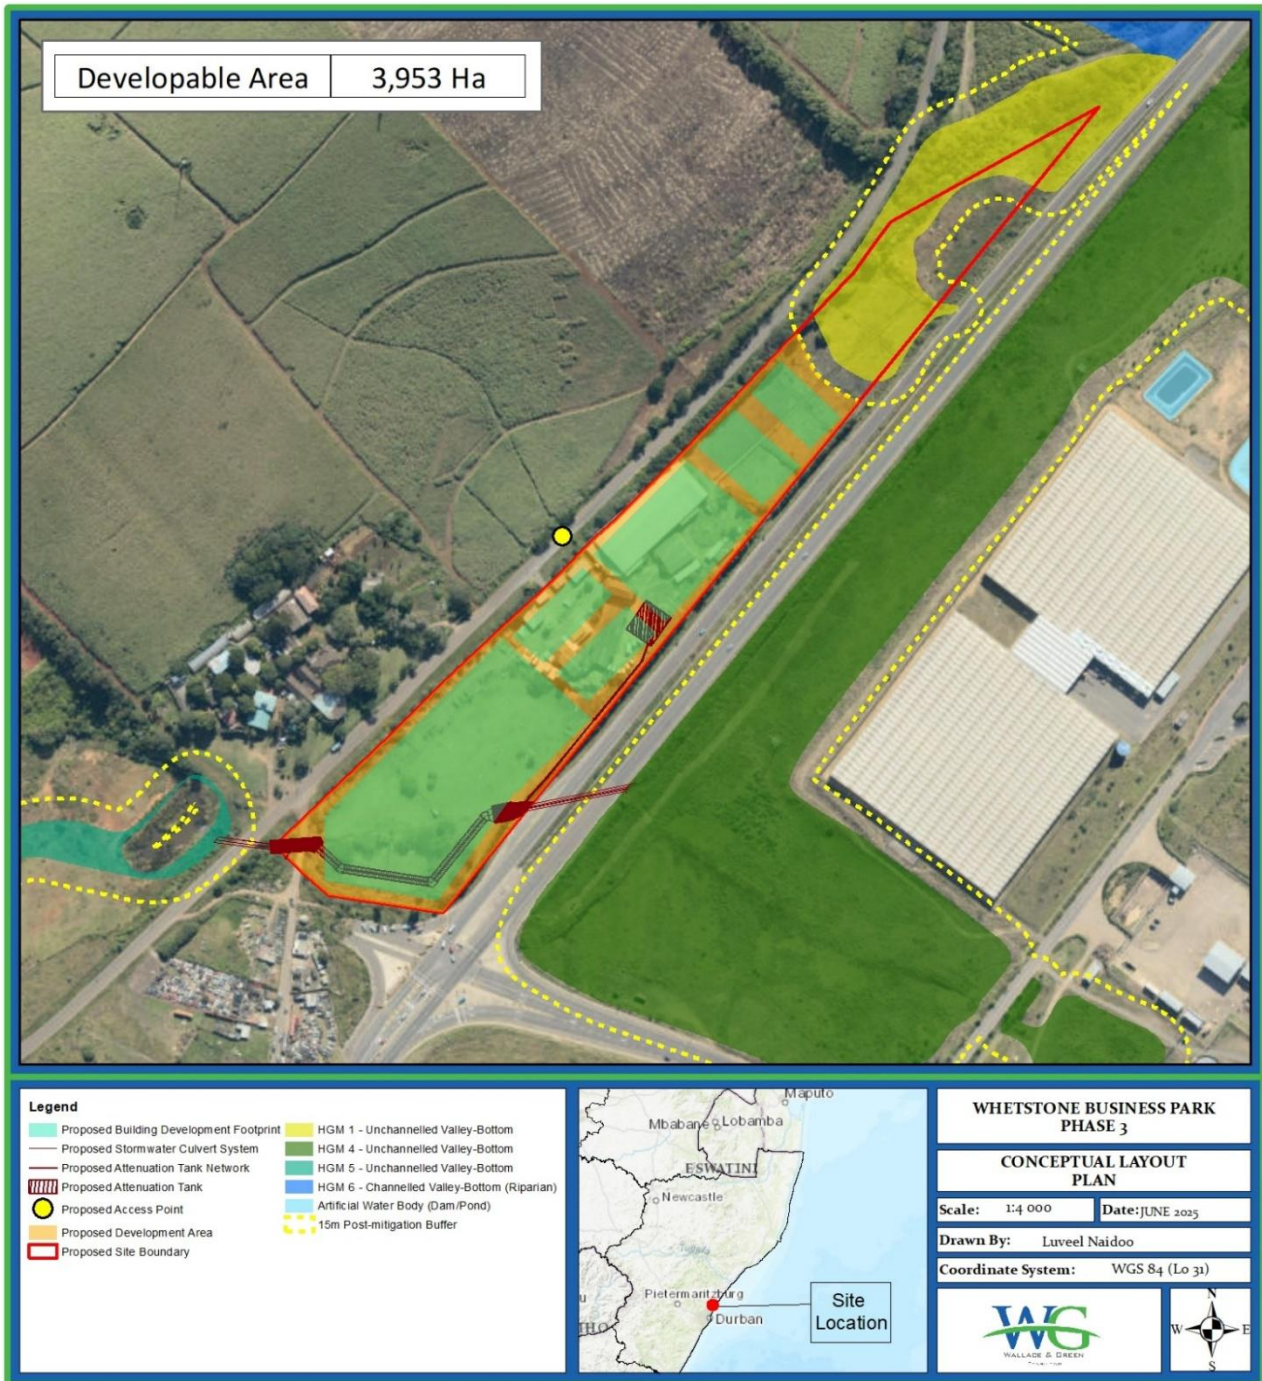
Conceptual Layout Plan for the proposed Whetstone mixed-use development.
